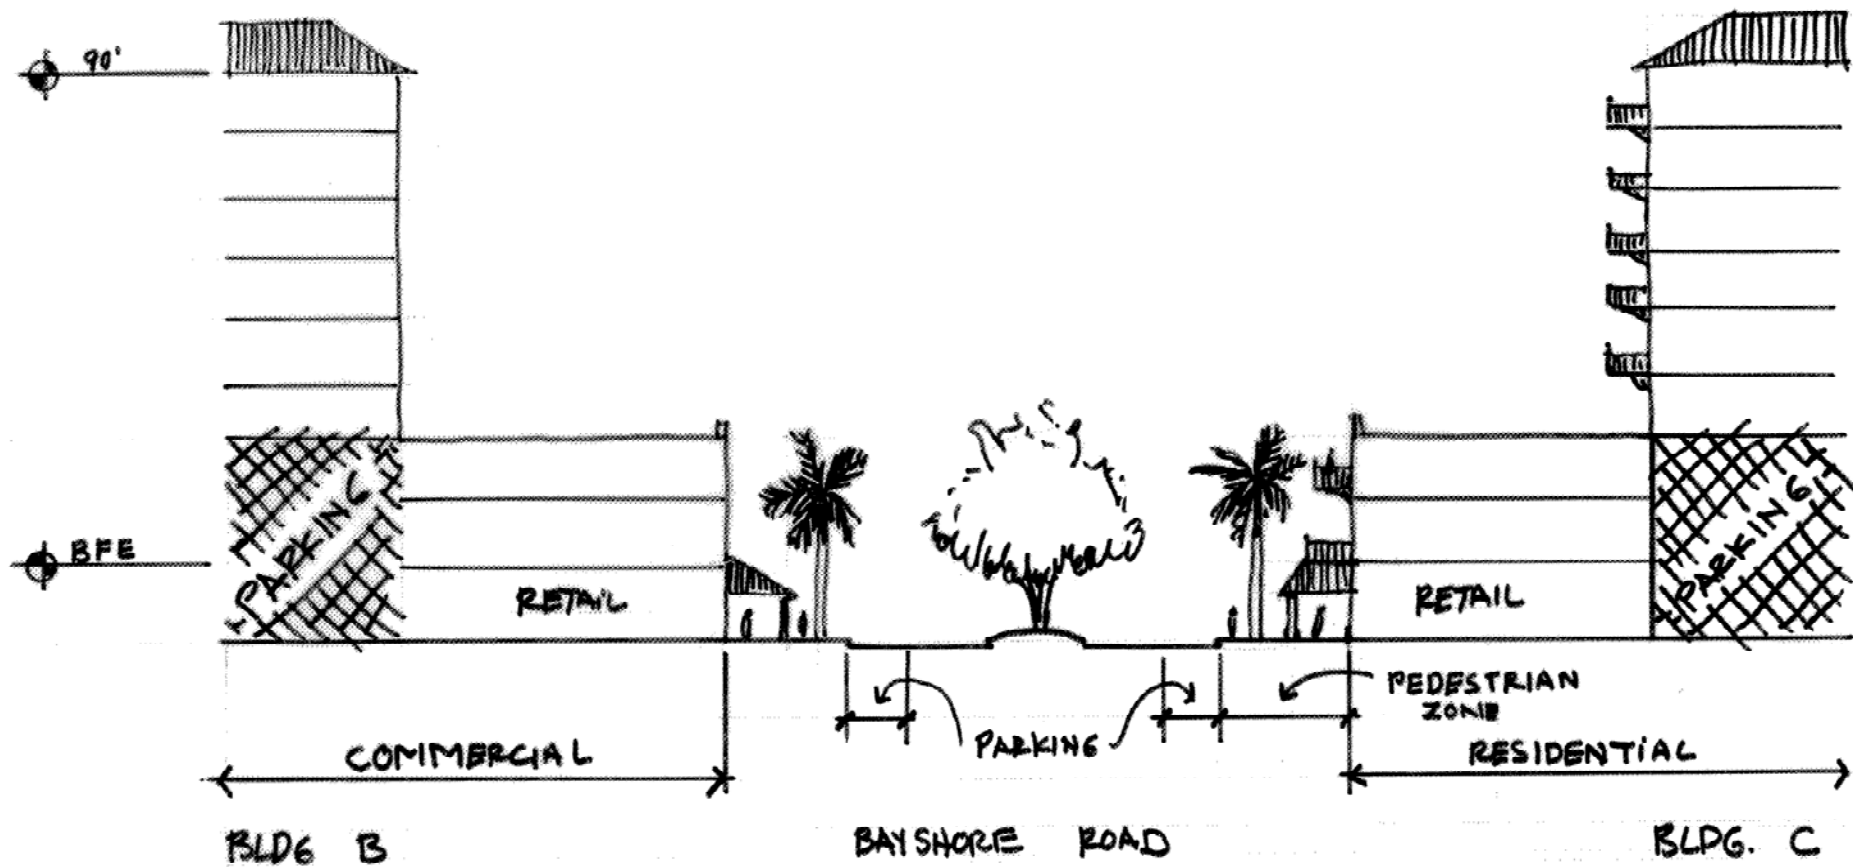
A Section of Bayshore Road between Buildings B and C facing east toward the River.
